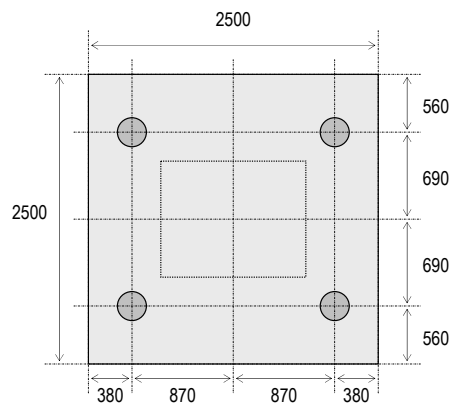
Airbag layouts, designed to provide maximum possible coverage along the face of each wall. Dimensions shown in millimetres.
